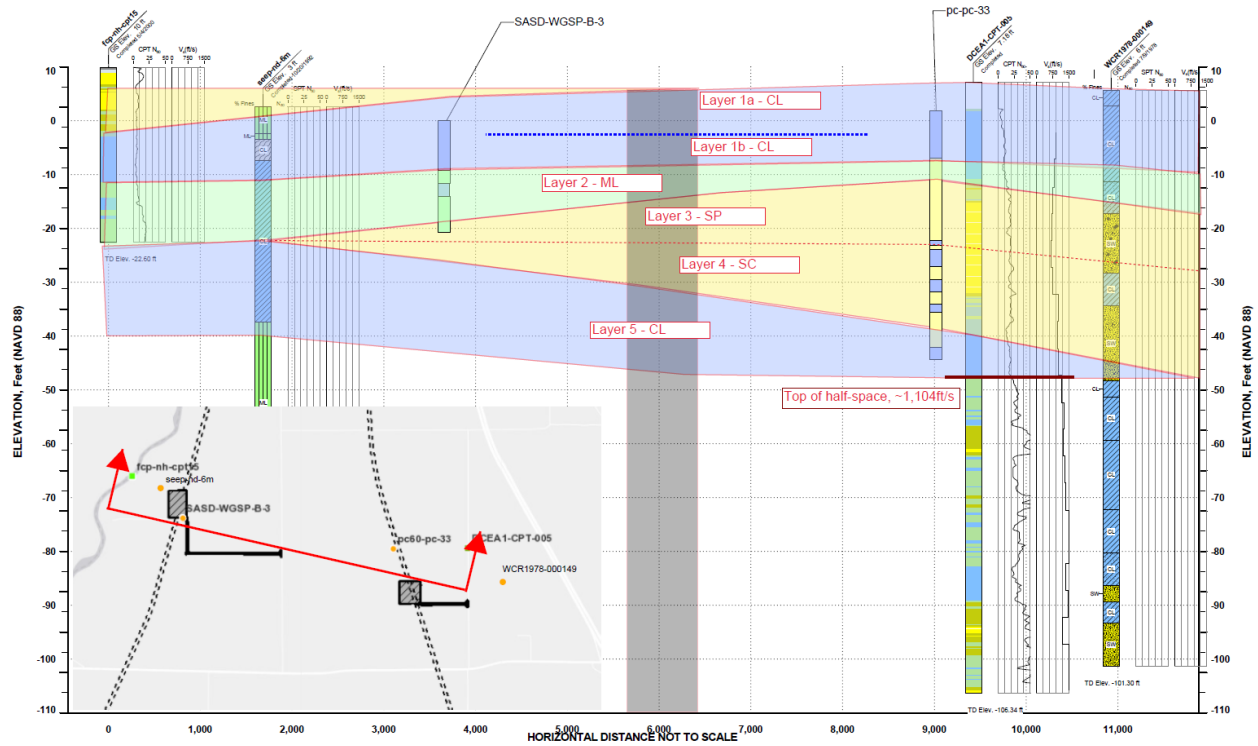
Idealized Soil Profile at New Hope Tract Facility Site
